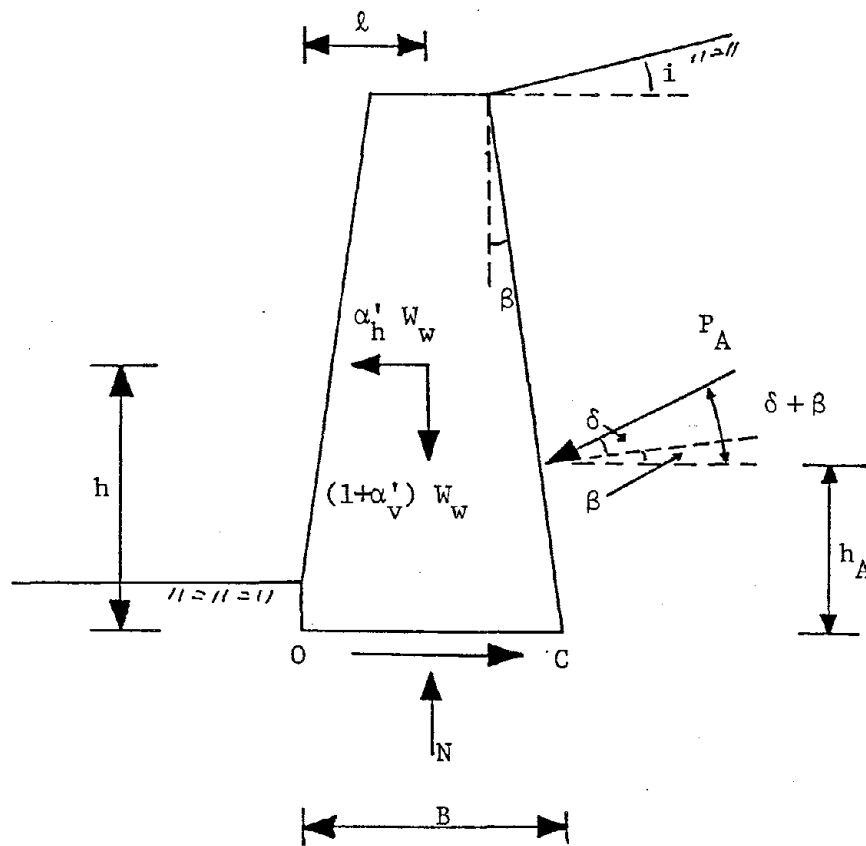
SEISMIC LOADING ON RETAINING WALL FOR OVERTURNING AND BASE SLIDING
